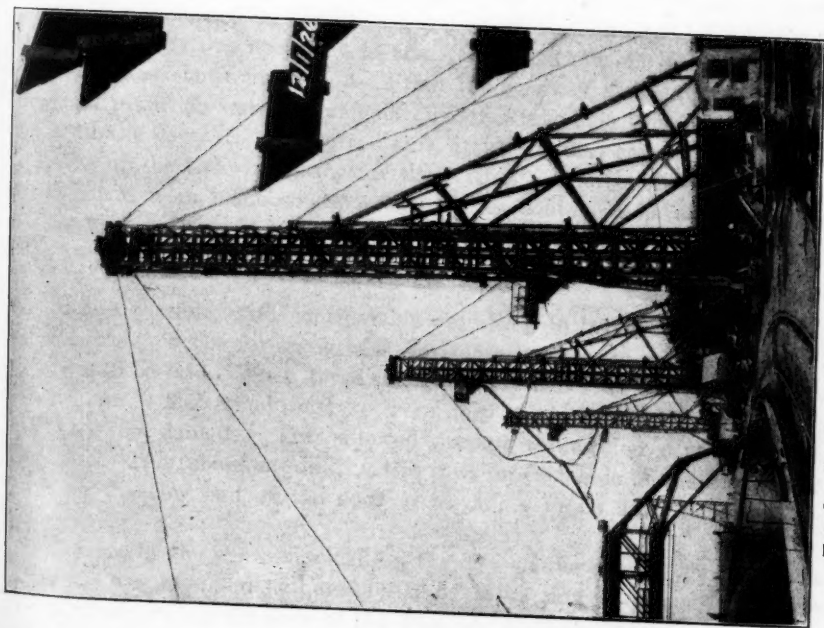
CONCRETE TOWERS AND CHUTE SYSTEM.
